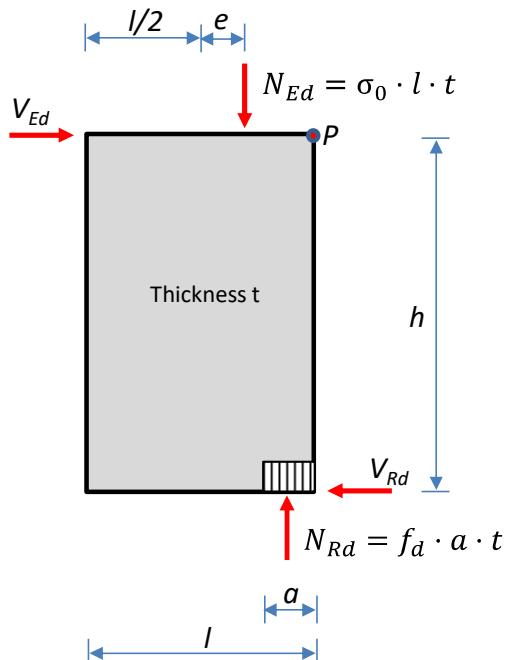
Equilibrium of a masonry wall subjected to vertical and horizontal loading
